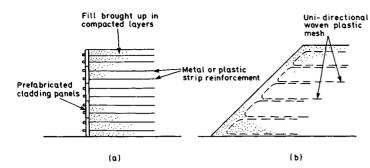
Reinforced soil construction. (a) Gravity-type retaining wall reinforced with strips of metal or plastic; (b) embankment reinforced wit woven plastics mesh
